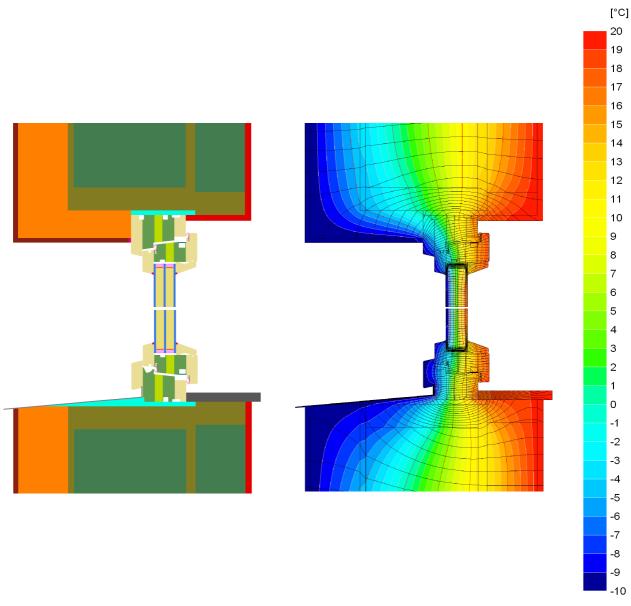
Installation 'bottom' und 'side/top' in a Timber construction wall with respective isothermal graphic
